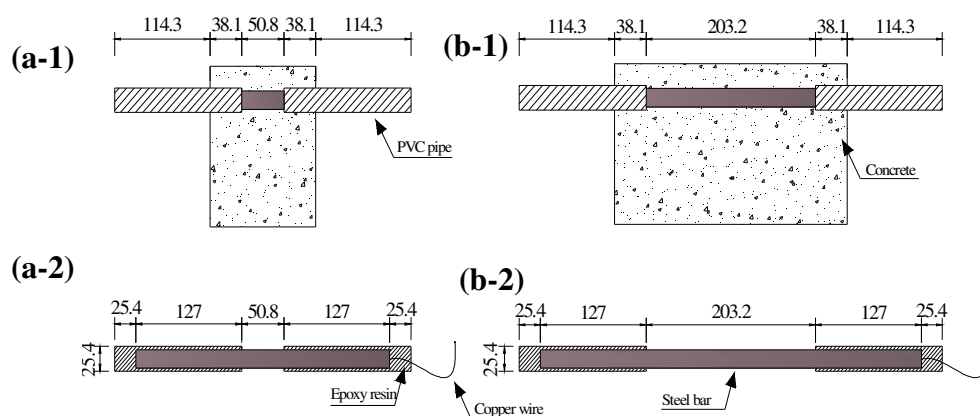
Details of short steel bars (a-1, a-2) and long steel bars (b-1, b-2) (unit: mm).
